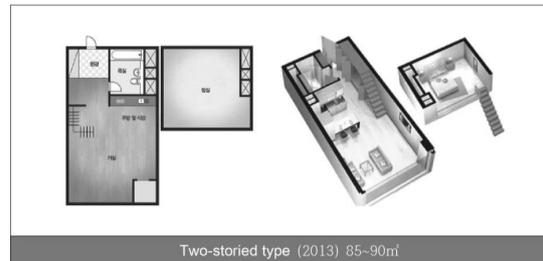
Two-storied type officetel plan layouts from 2013.
